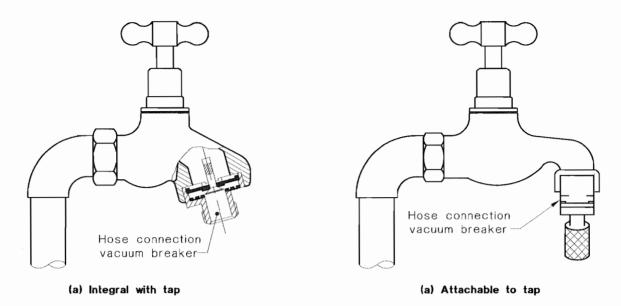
TYPICAL INSTALLATIONS OF EXTERNAL HOSE CONNECTION VACUUM BREAKERS
